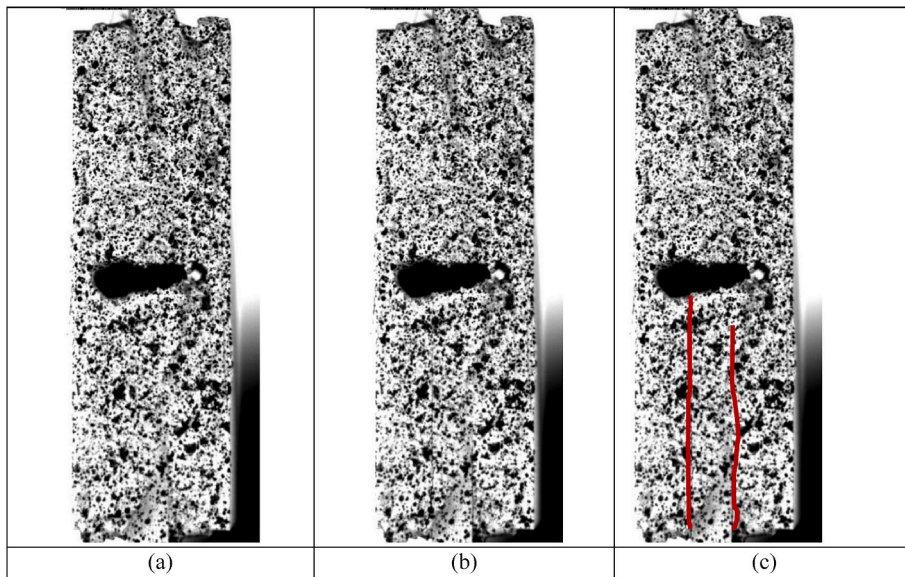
Detailed view of the failed adhesive area, test CS4#1: a) absence of cracks before failure; b-c) presence of cracks at failure.
